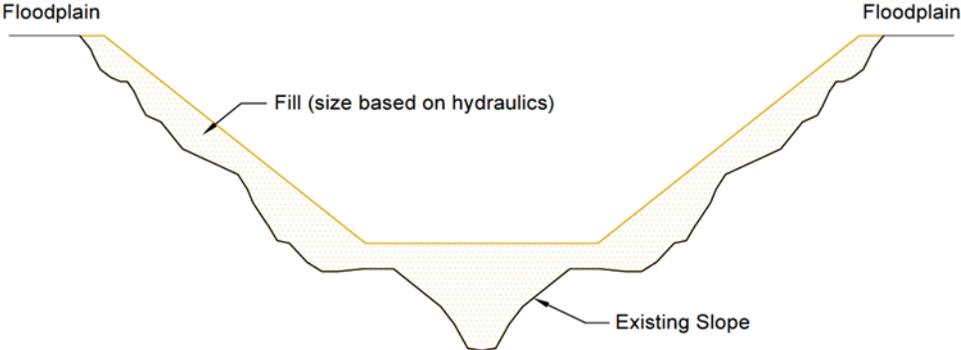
Typical Cross-Section Concept Design (Not to Scale)
